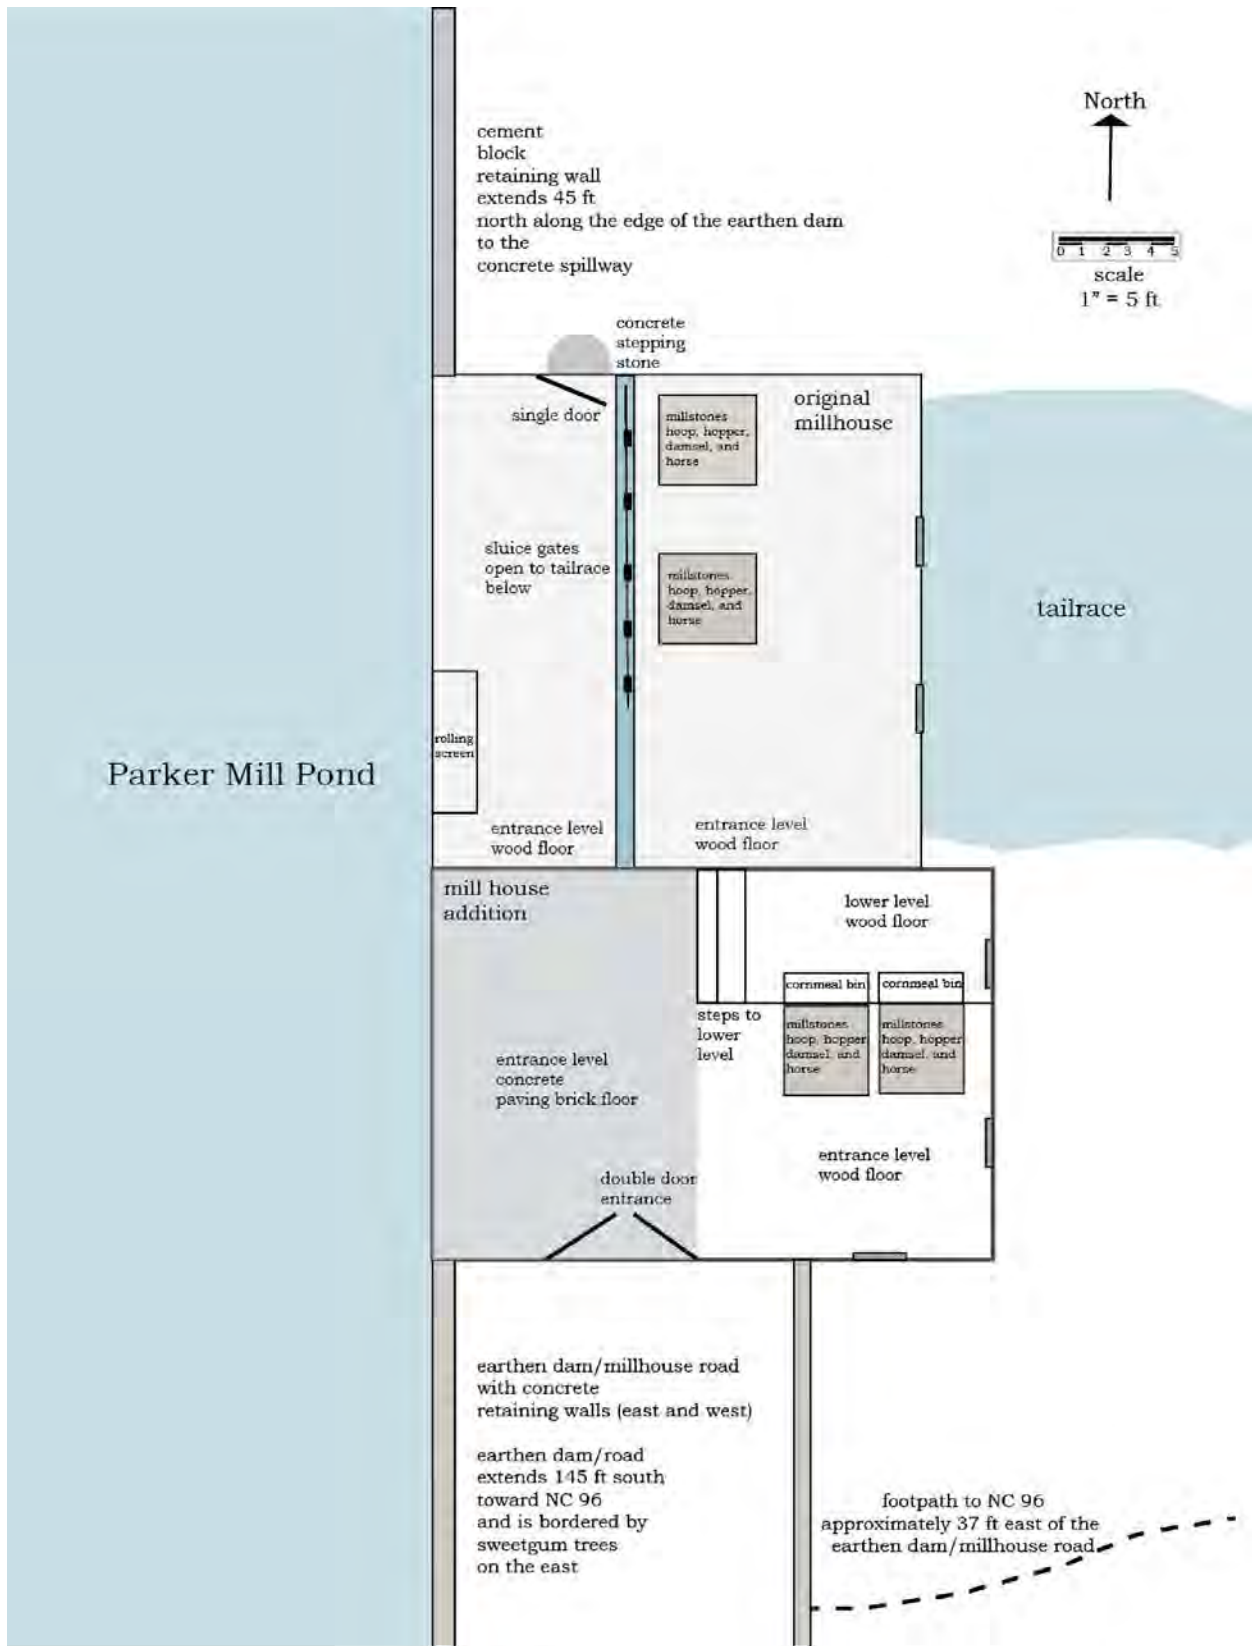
Parker Mill site plan, showing the original millhouse and later addition.
